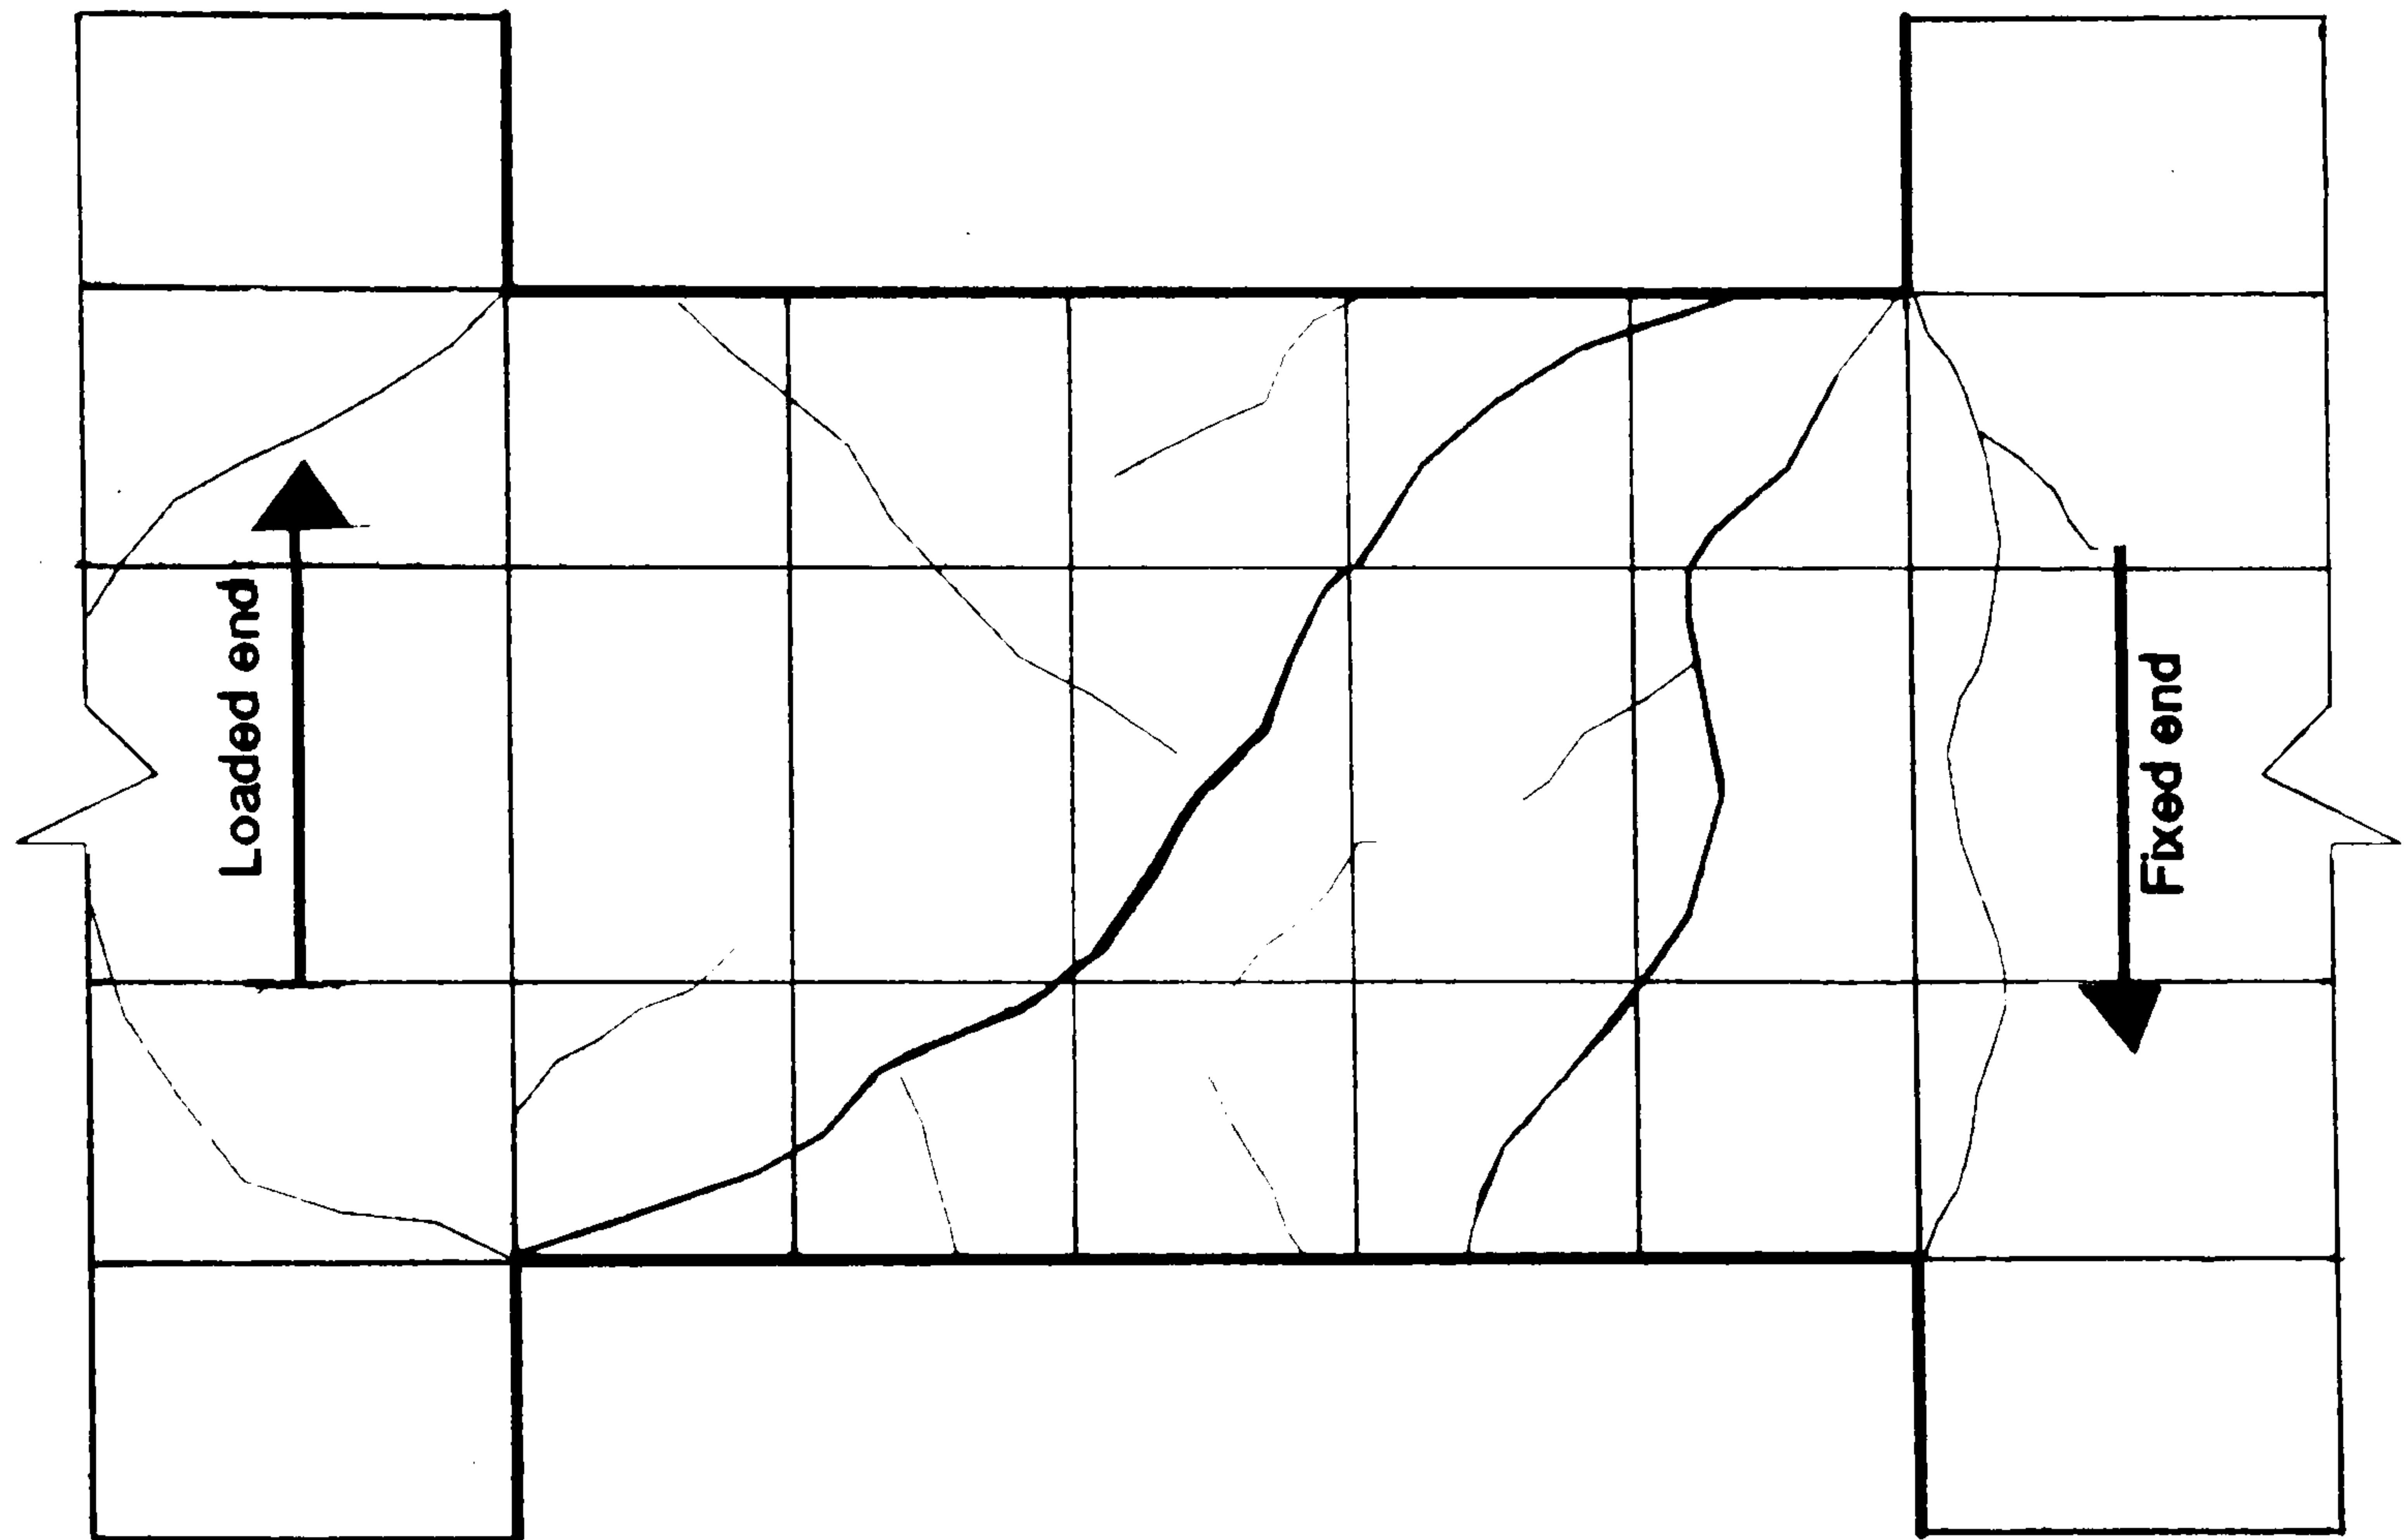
Failure mechanism and crack pattern for beam CBM1
